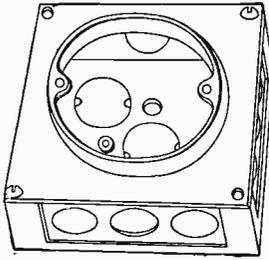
Universal and Knock-Out Type of Outlet Box.
